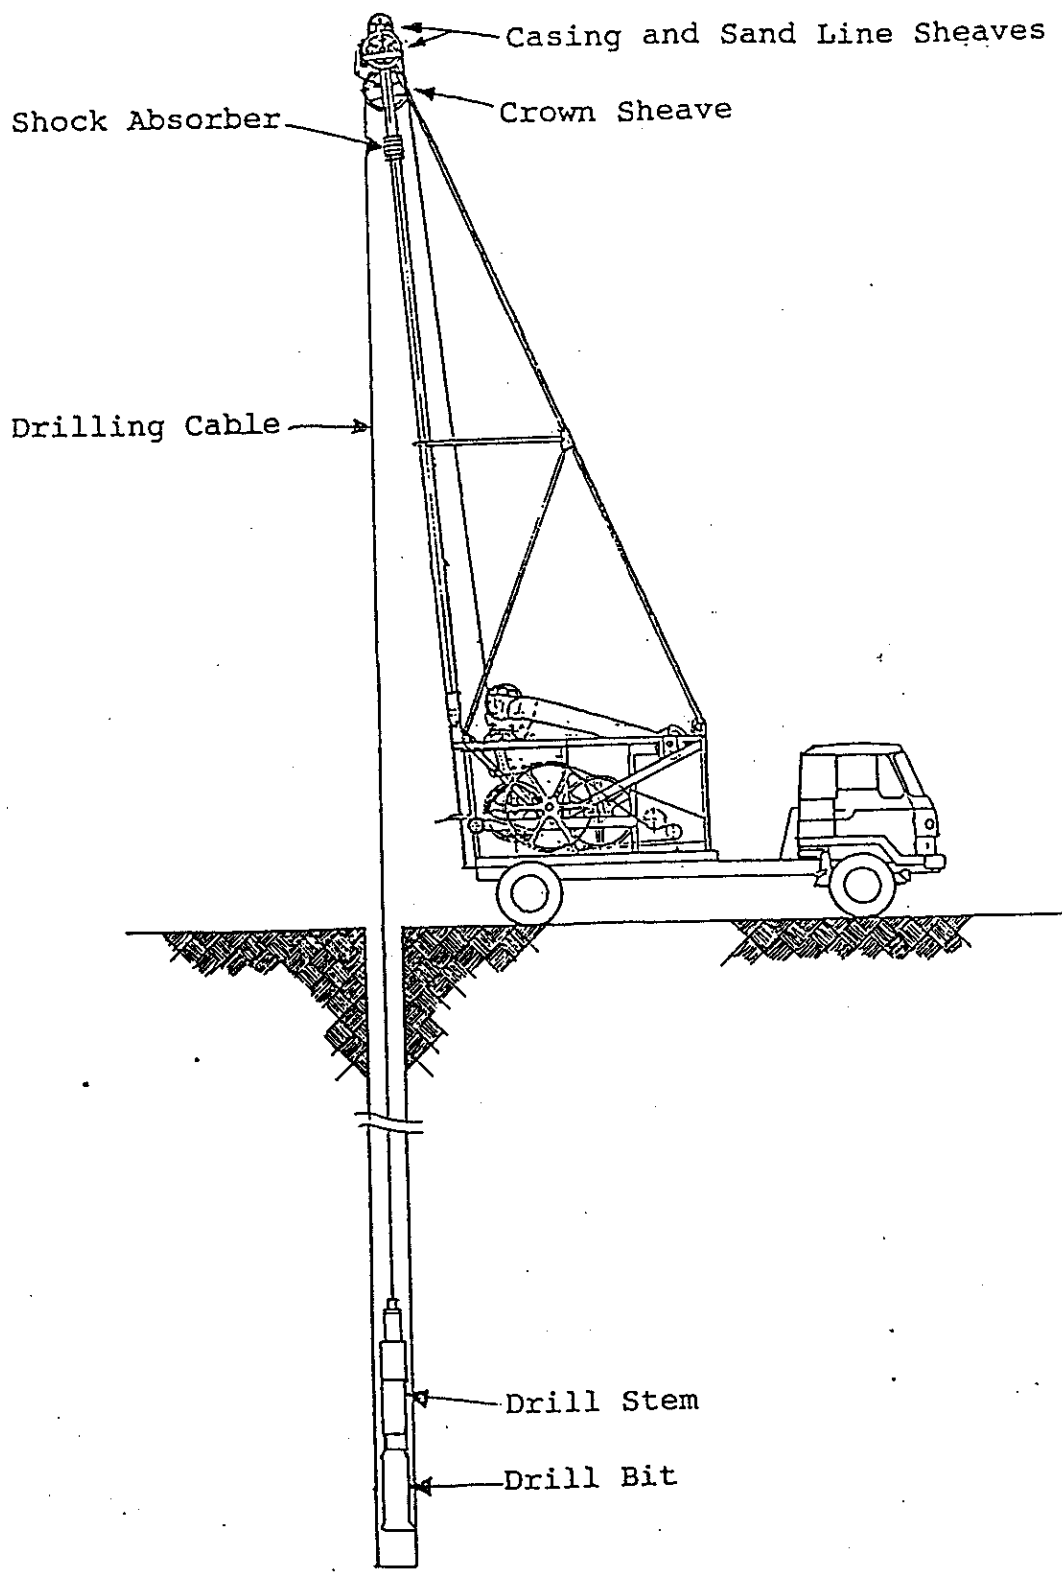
PERCUSSION TYPE DRILLING MACHINE
